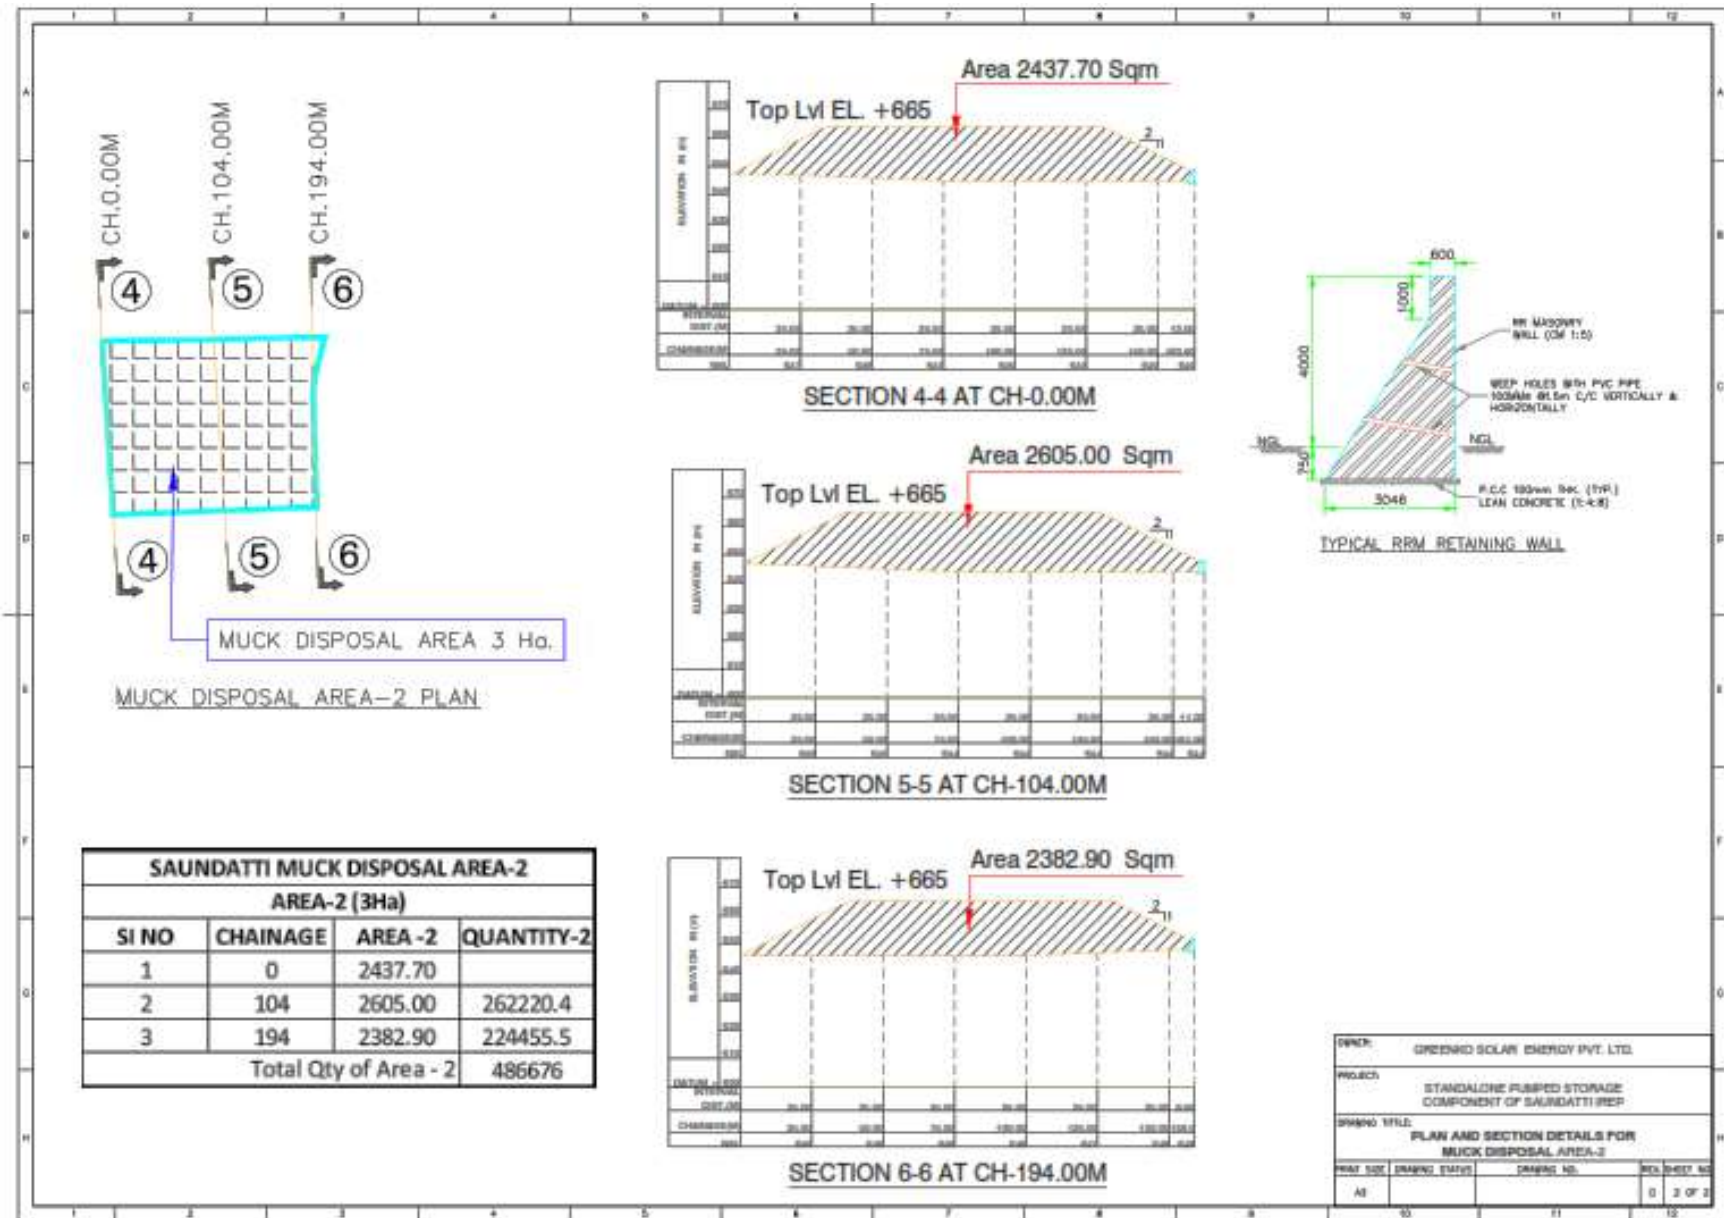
Cross-sections of Muck Dumping Site-2
